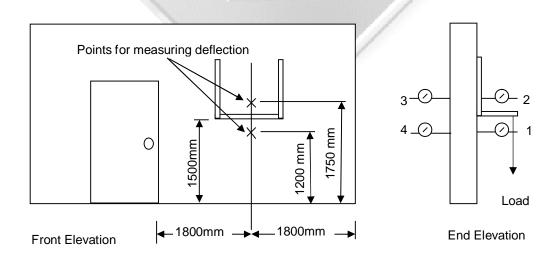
Locations of applied load for heavyweight anchorage (High level wall cupboard) eccentric downward loading test
